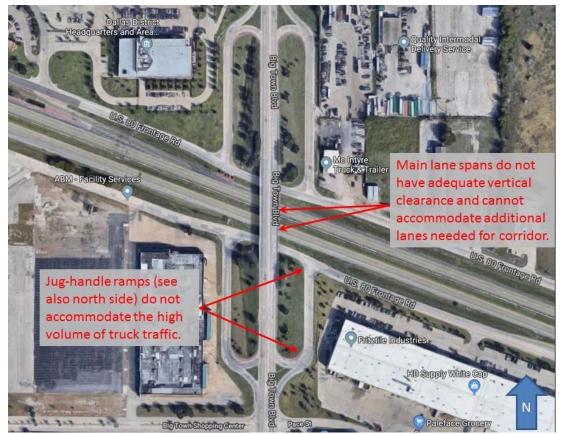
Existing configuration cannot meet nor be modified to meet project purpose and need based on location of bridge columns and geometric constraints of connections between US 80 and Big Town Boulevard.
